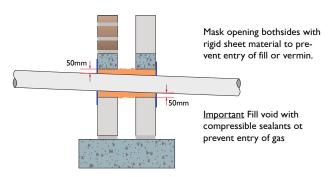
Extract from Approved Document H – Pipes penetrating walls
